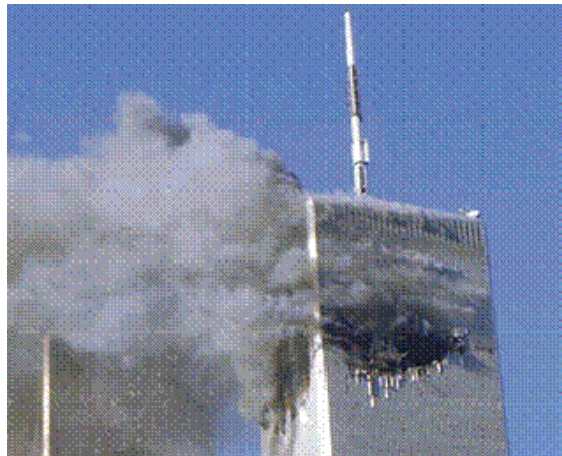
North Tower of World Trade Center, Illustrating the ability of the perimeter frame to bridge around the massive aircraft impact damage and arrest progressive collapse.
